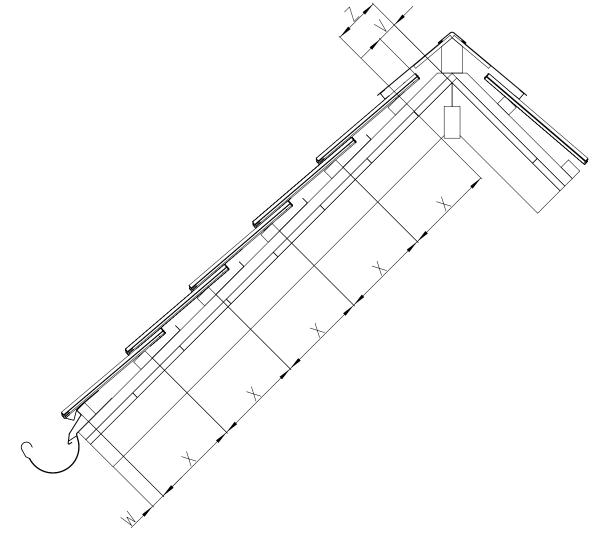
Profile view with dimensions for mounting on a roof with ridge
